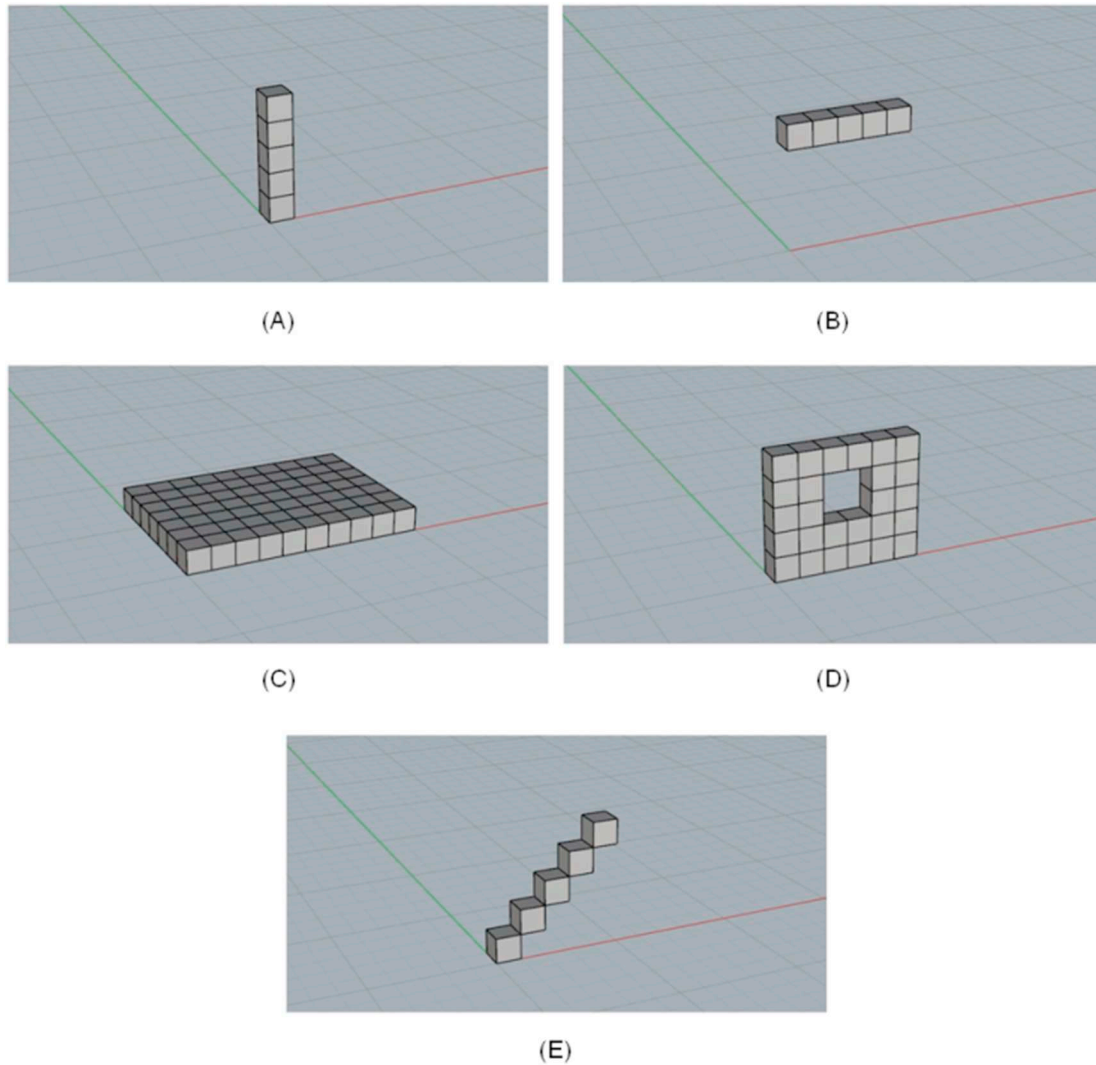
Architectural structural elements used in the habituation phase: (A) pillar; (B) beam; (C) slab; (D) wall with window; (E) and stairs.
